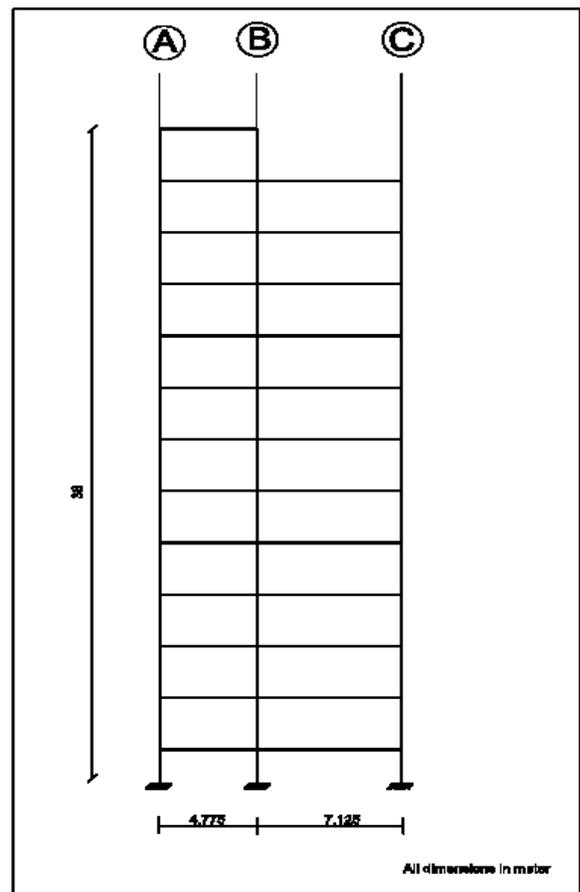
Elevation view of frame 2, 3 and 4 (Structure-01)
